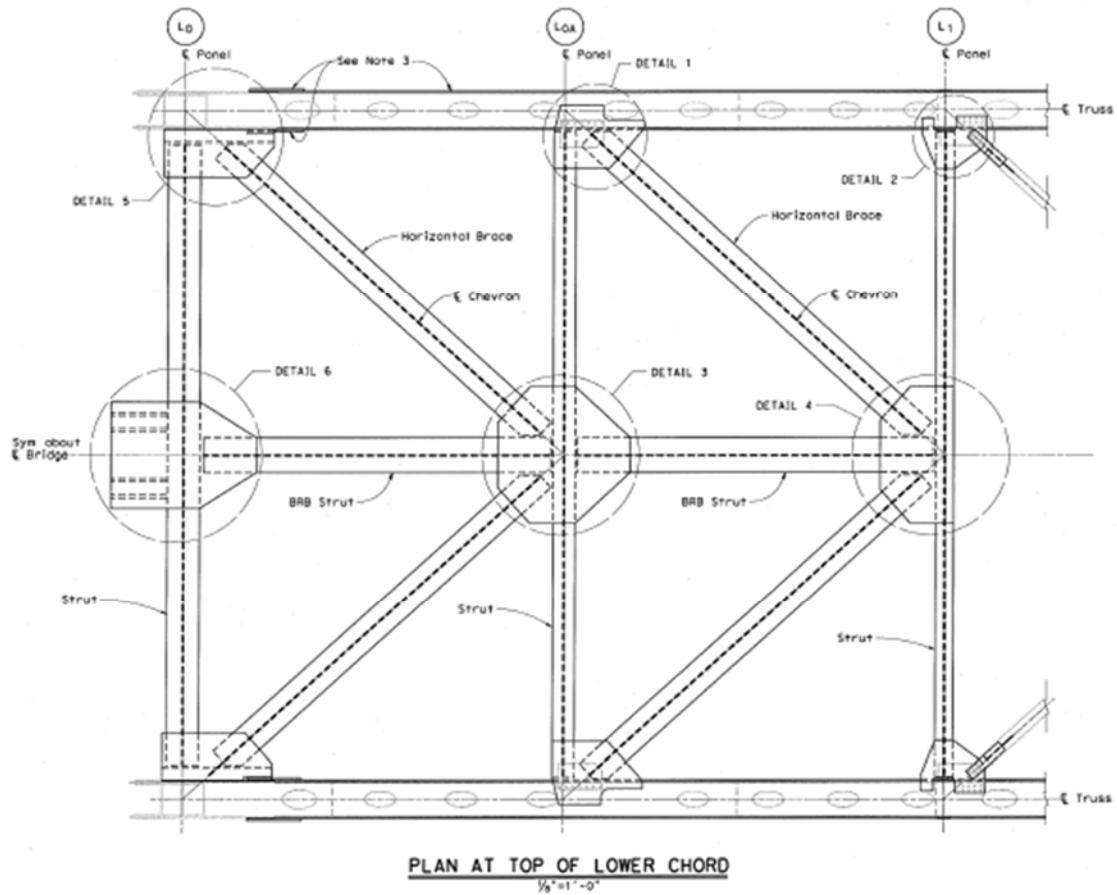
Plan View of BRBs Installed in Location 2 (Reno and Pohl, 2010a)
